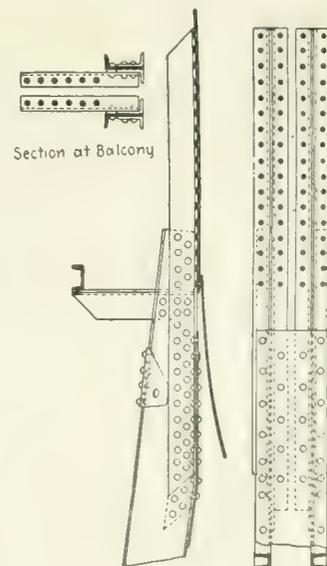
Detail of Attachment of Tank Shell to Tower Post and Circular Girder Construction.
